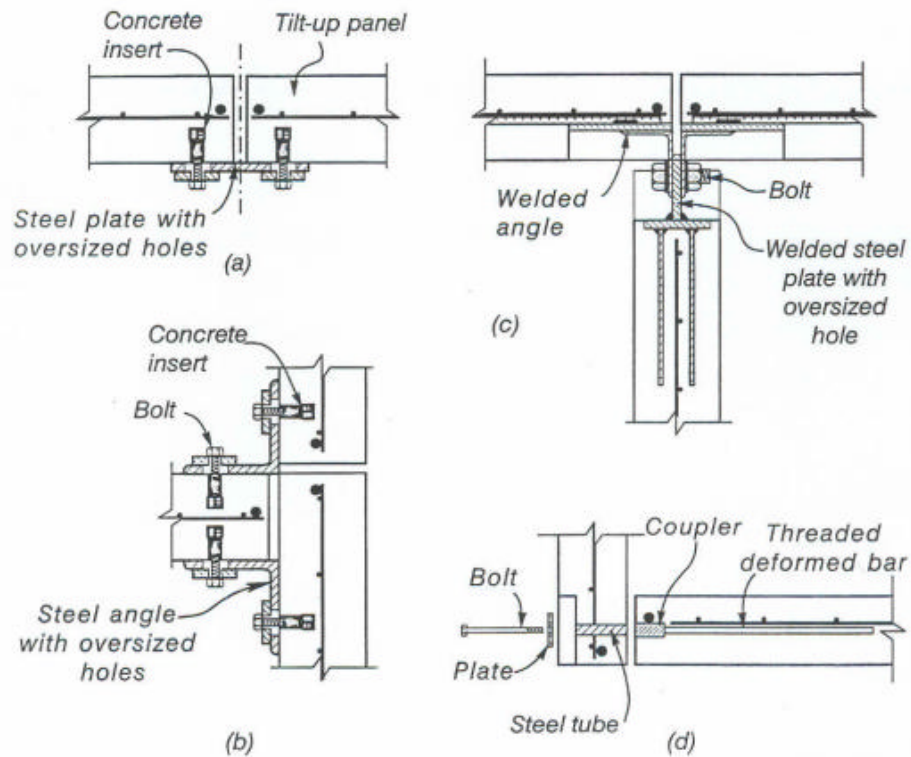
Typical bolted connections between tilt-up walls (Restrepo *et al.*, 1996)
